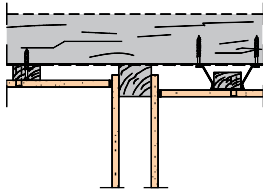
Ceiling to Partition junction leave a 5 mm gap between the fermacell ceiling and other building substrates. This can be filled using a flexible decorators filler.
